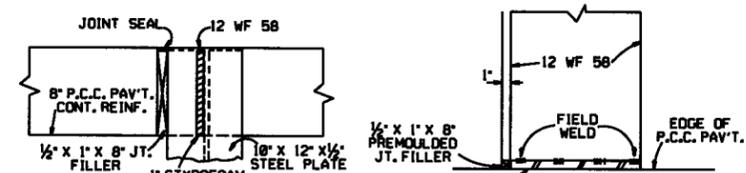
DETAIL OF END PLATE ATTACHMENT TO WIDE FLANGE BEAM
